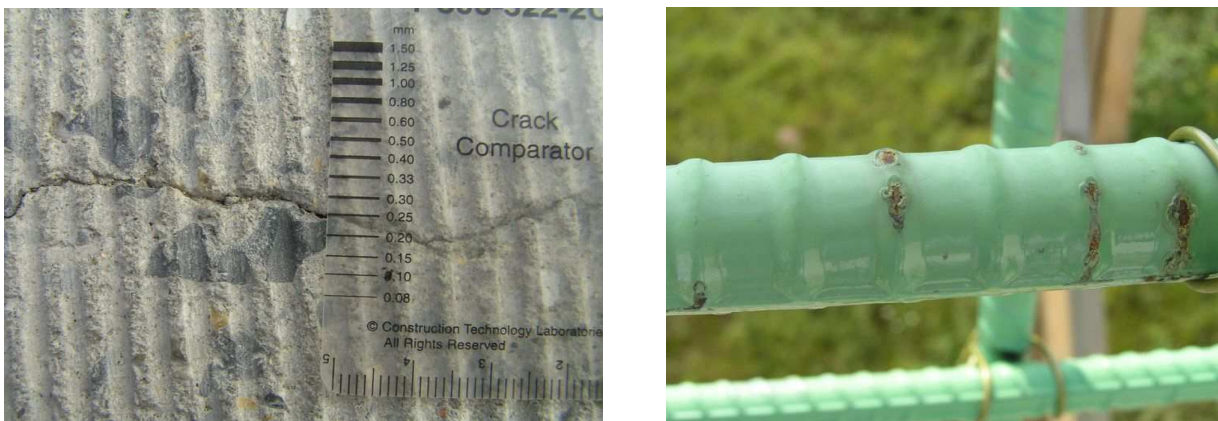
Crack on the Grinded Bridge Deck (left) and Scratched Epoxy-coating (right).
